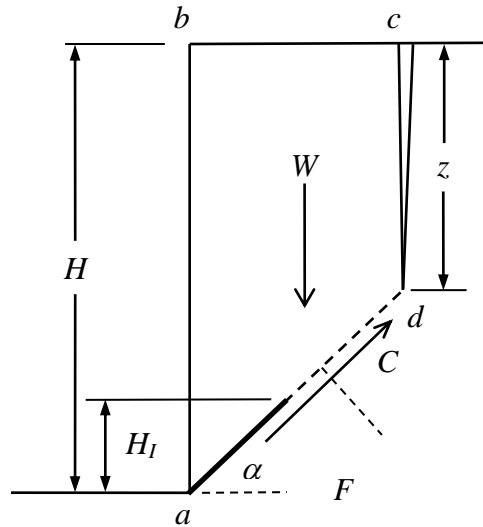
Vertical Slope with Plane Failure Surface, Tension and Toe Crack.
